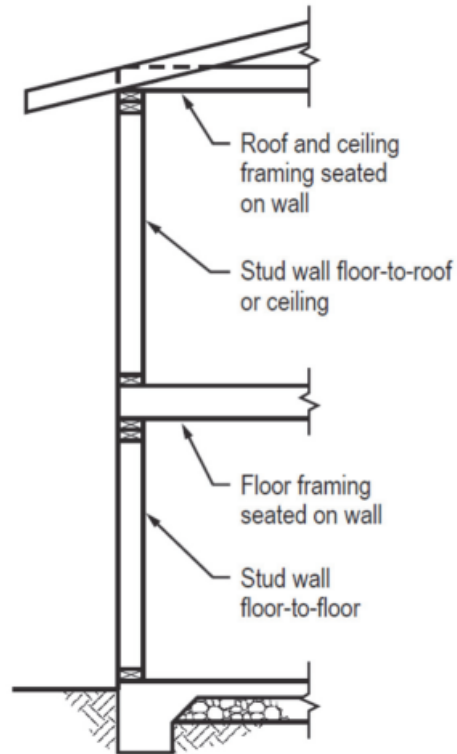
Section through perimeter of two-story wood framed building (NIST, 2014)
